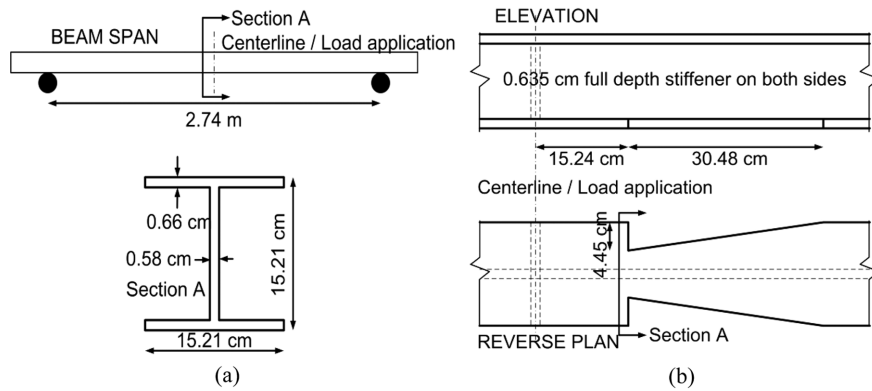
Dimensions of the steel $W6 \times 15$ (SI: $W150 \times 22.5$) section, (a) beam span and cross section and (b) elevation and plan views of the flange in the tension side
